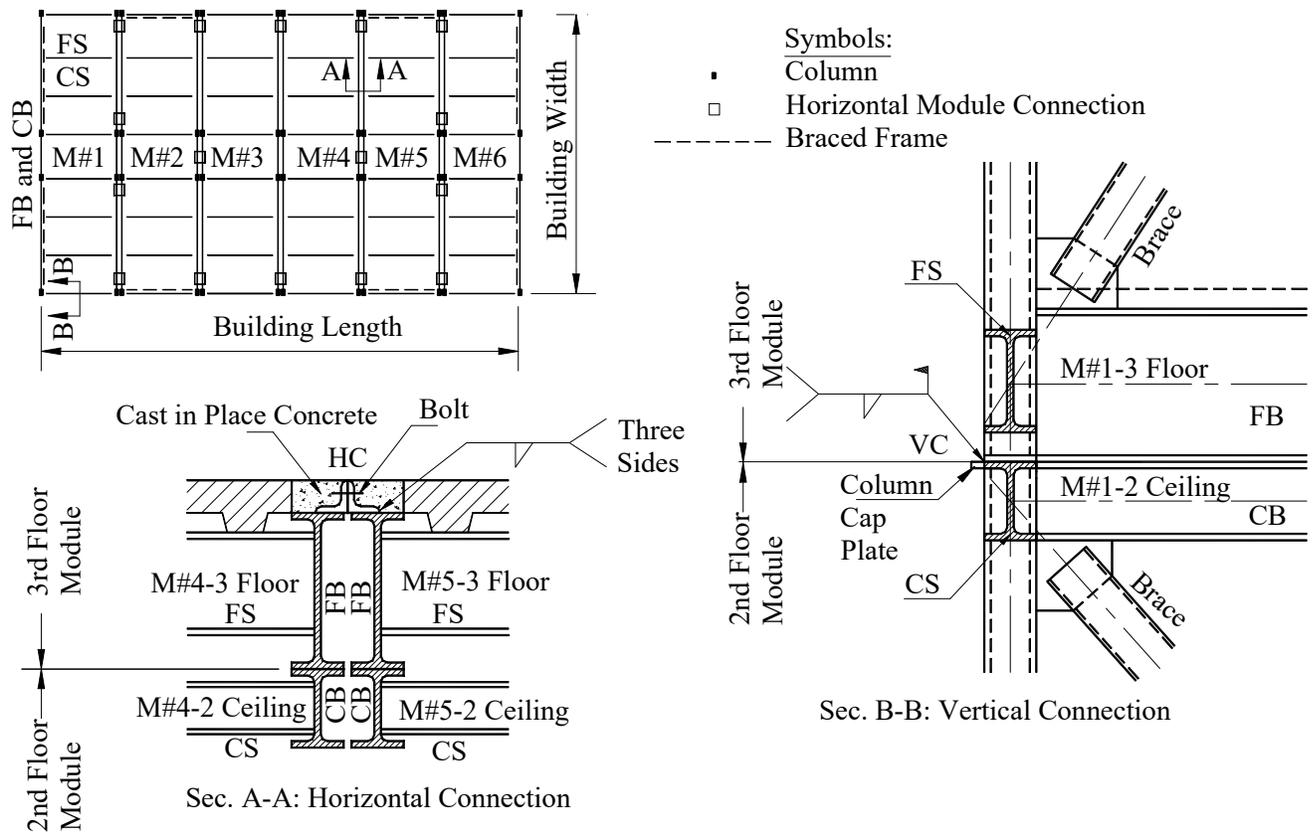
Typical plan and sections for a modular steel building (Annan et al., 2009a)
